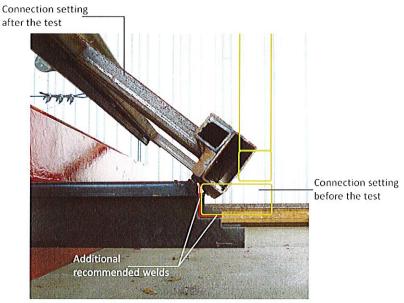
Wall-to-floor connection setting before and after the test, additional recommended welds have been shown.
